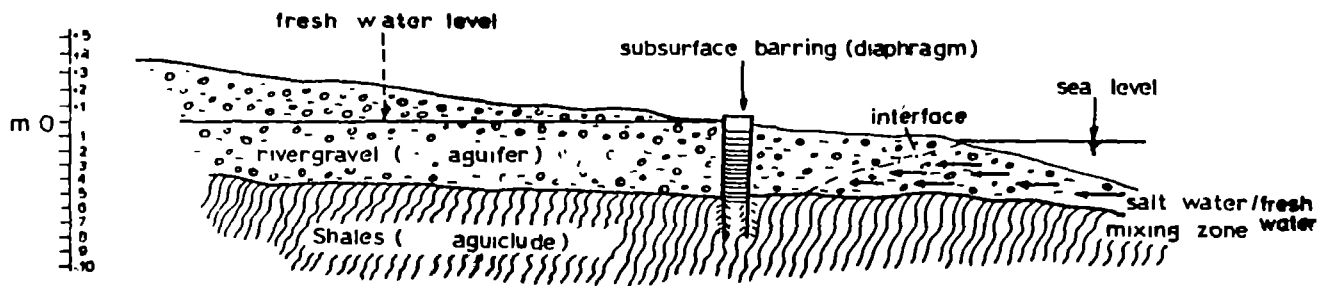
Schematic longitudinal section of an aquifer with sub-surface dam (Garagunis 1981).
